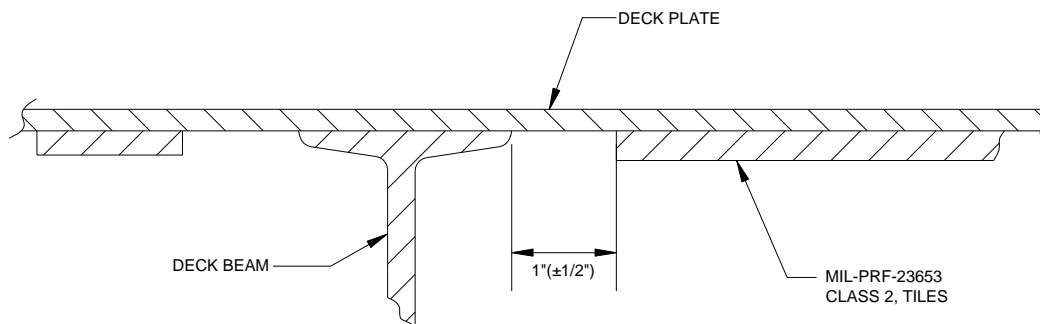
Cross-section view of installation of MIL-PRF-23653 tiles to underside of platform deck (not to scale).
